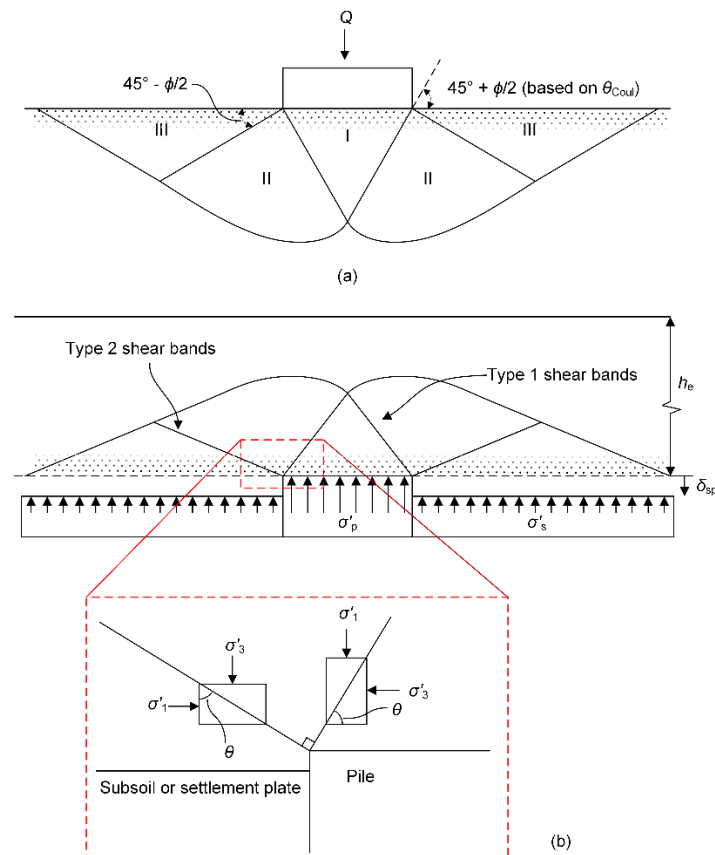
(a) General shear failure of a shallow foundation; (b) failure mechanism observed in dense sand samples in model piled embankments (not to scale)
